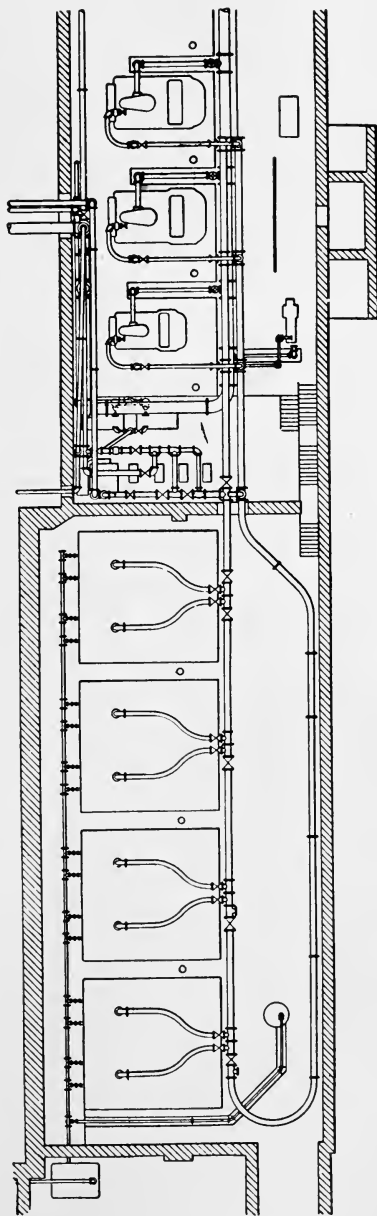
Plan of High-pressure Piping, Princeton University Power Plant.
